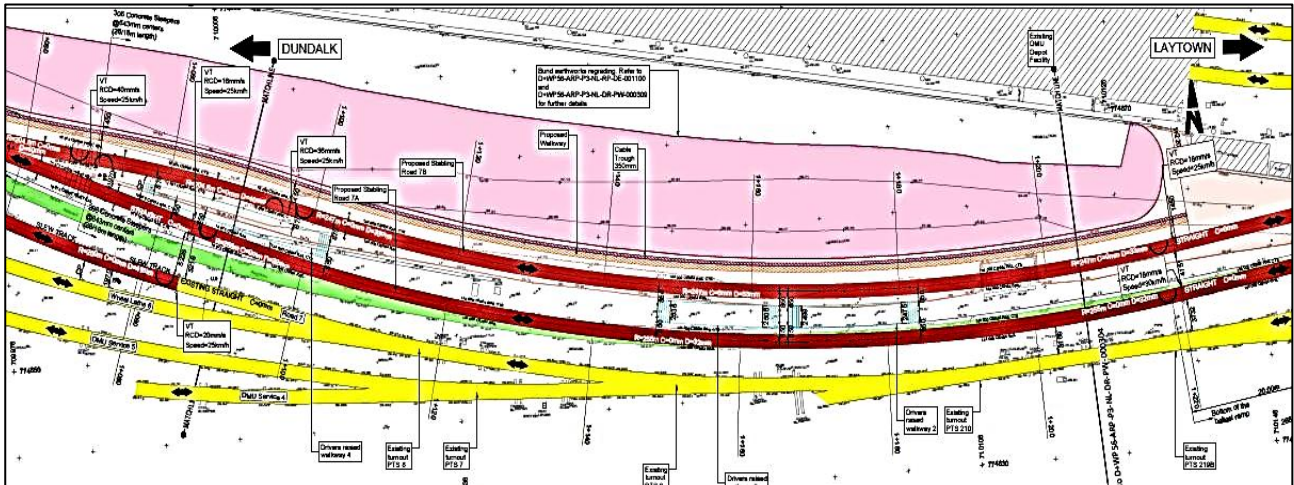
Proposed new sidings 7A & 7B (red lines)
